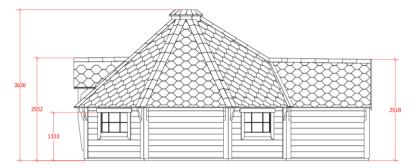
Elevations of the smaller cabins to be located at the north western end of the application site
